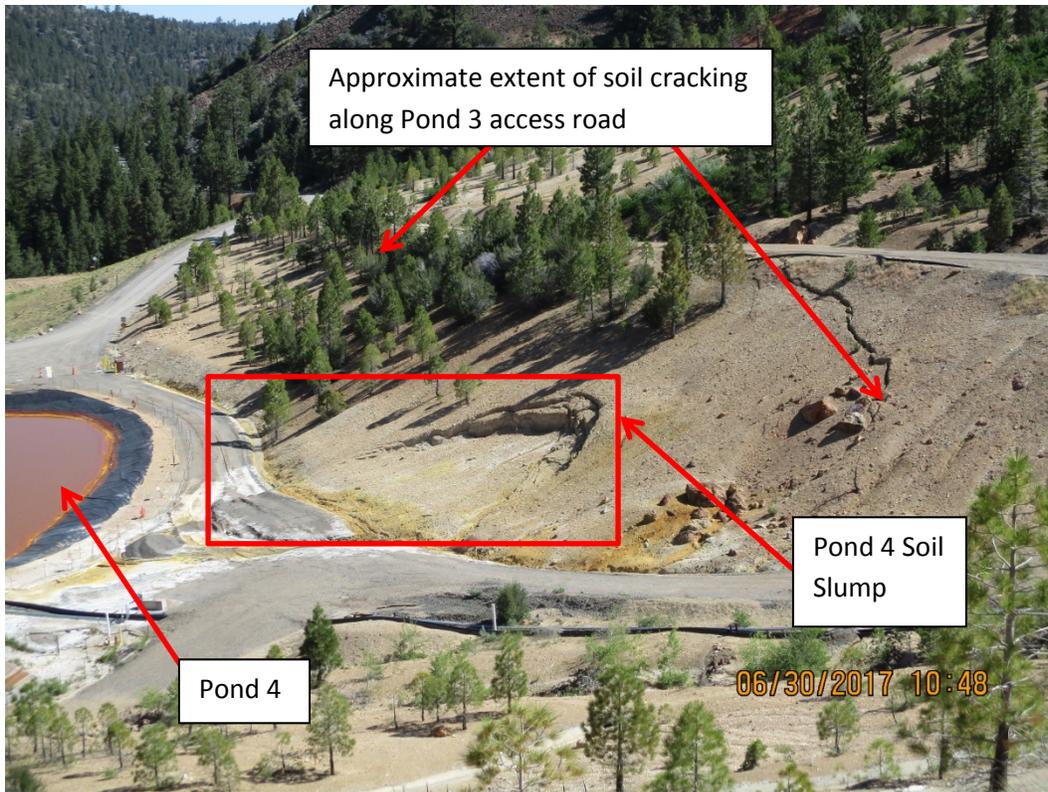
June 30, 2017, Further development of the Pond 4 Soil Slump
